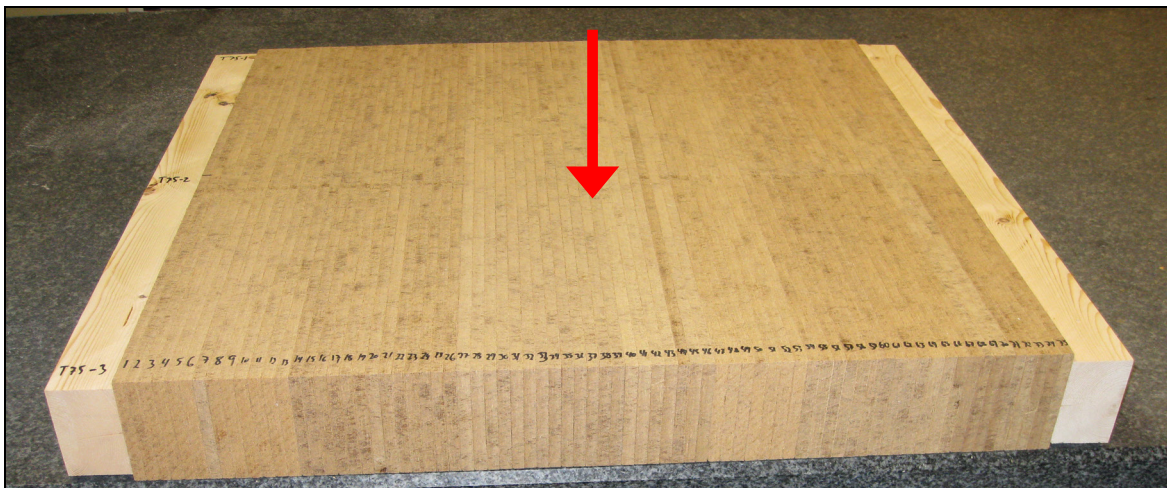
Test specimen with arrow showing heat transfer in longitudinal direction.
